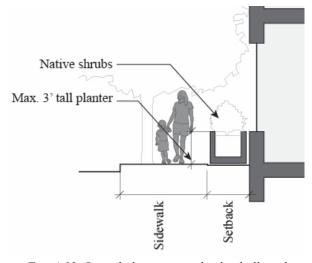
Raised planters in setbacks shall not be taller than 3'.
